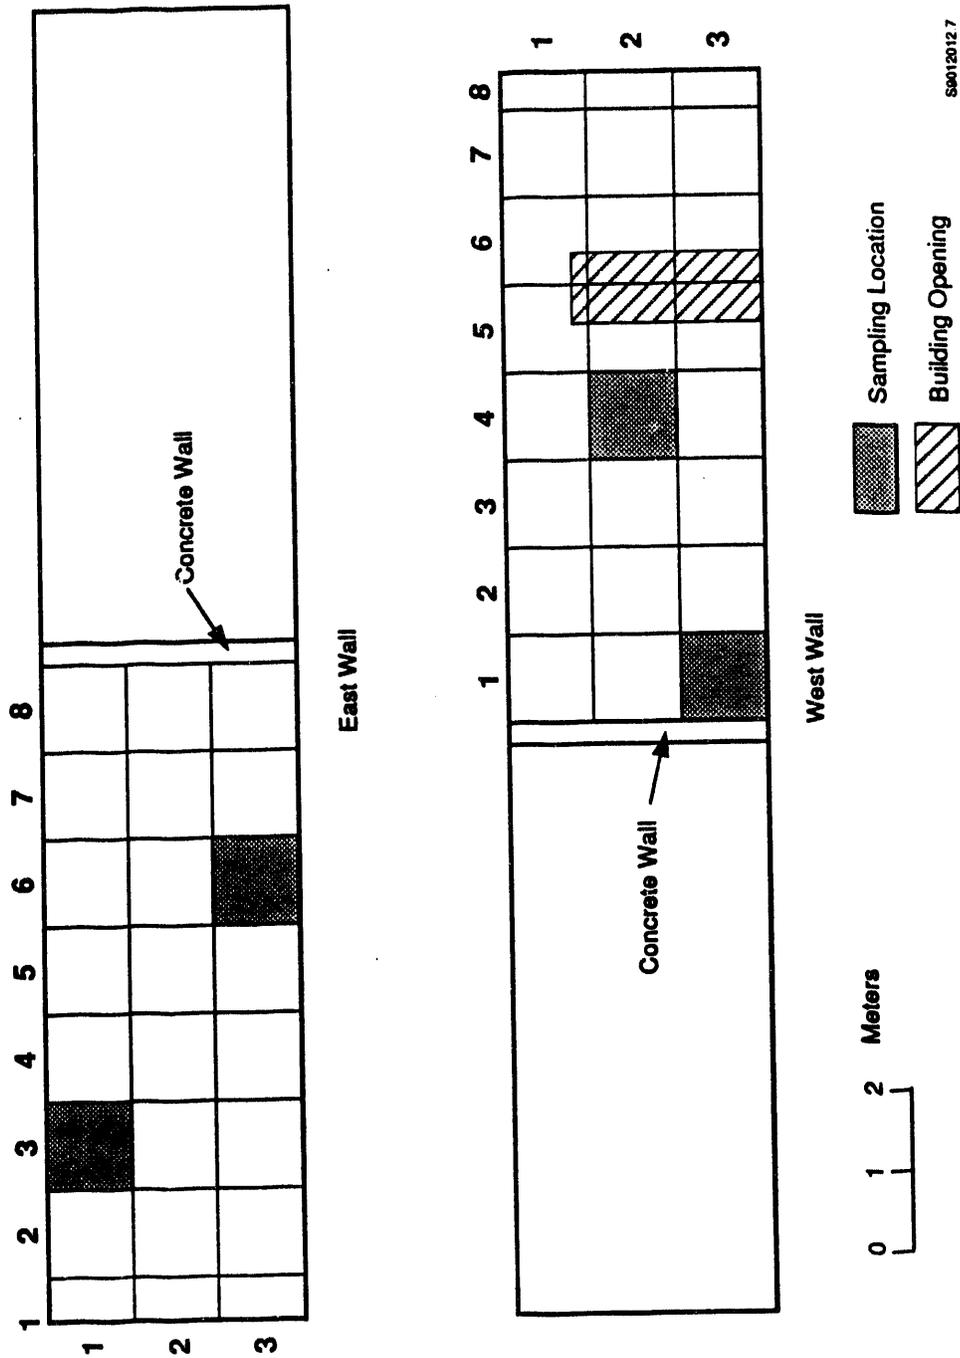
303-K Storage Facility, East and West Wall Sampling Location.
